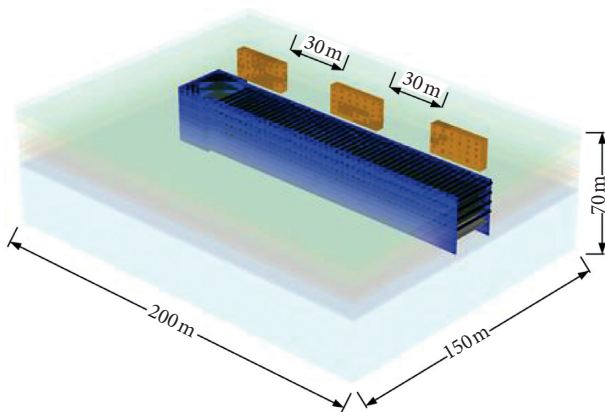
Three-dimensional numerical model of the longitudinal wall of buildings parallel to the foundation pit.
